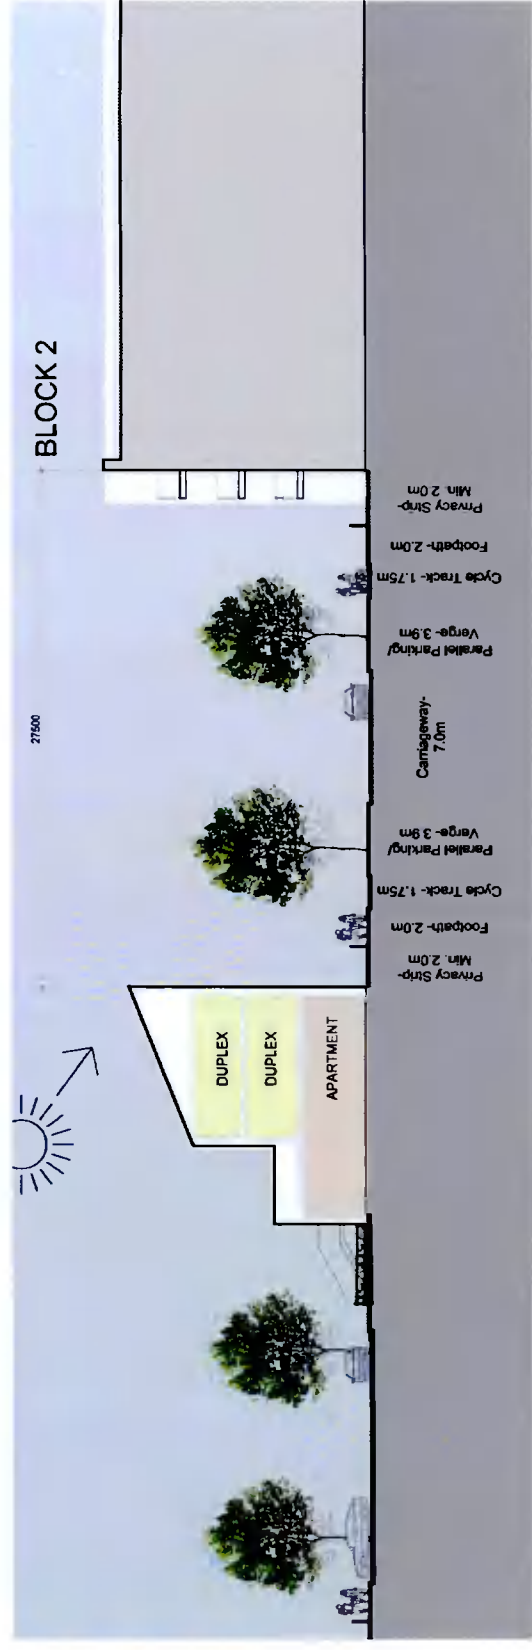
INDICATIVE LINK STREET / AVENUE SECTION
